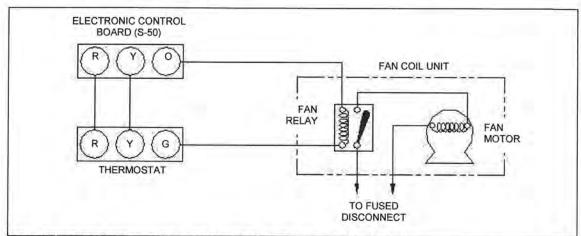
SINGLE THERMOSTAT USED FOR COOLING ON A FAN COIL UNIT
